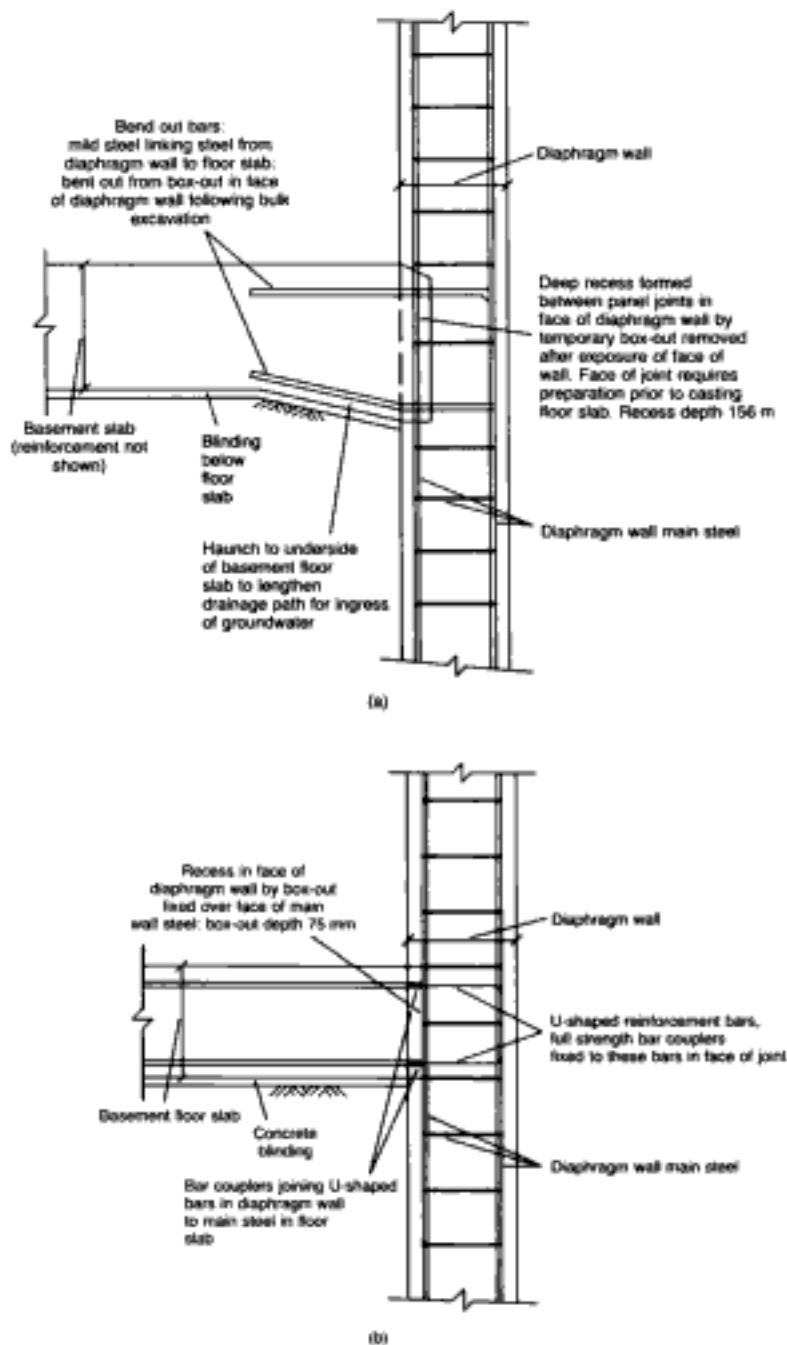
Vertical cross-sections of typical horizontal joints between diaphragm wall and basement floor slab: (a) to achieve resistance to groundwater ingress and transmission of vertical shear; (b) moment connection by couplers
